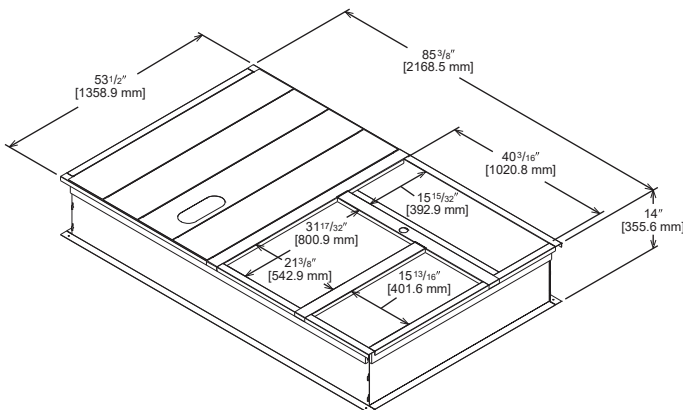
Typical Roofcurb Installation: MPS H07D – H12D
